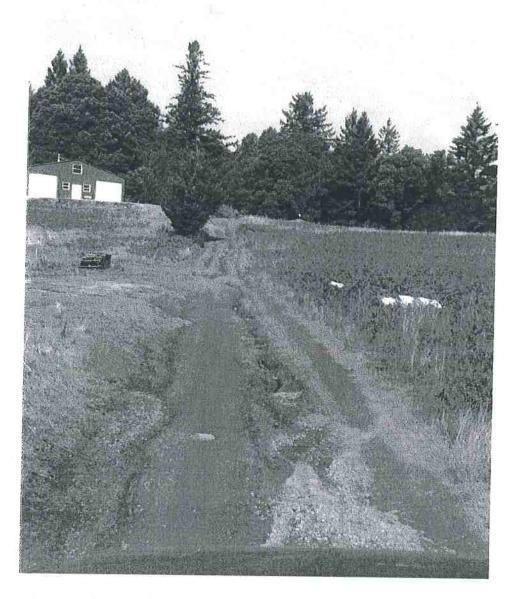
Evidence of surface erosion and rutting on road. Photo date 11-11-16
